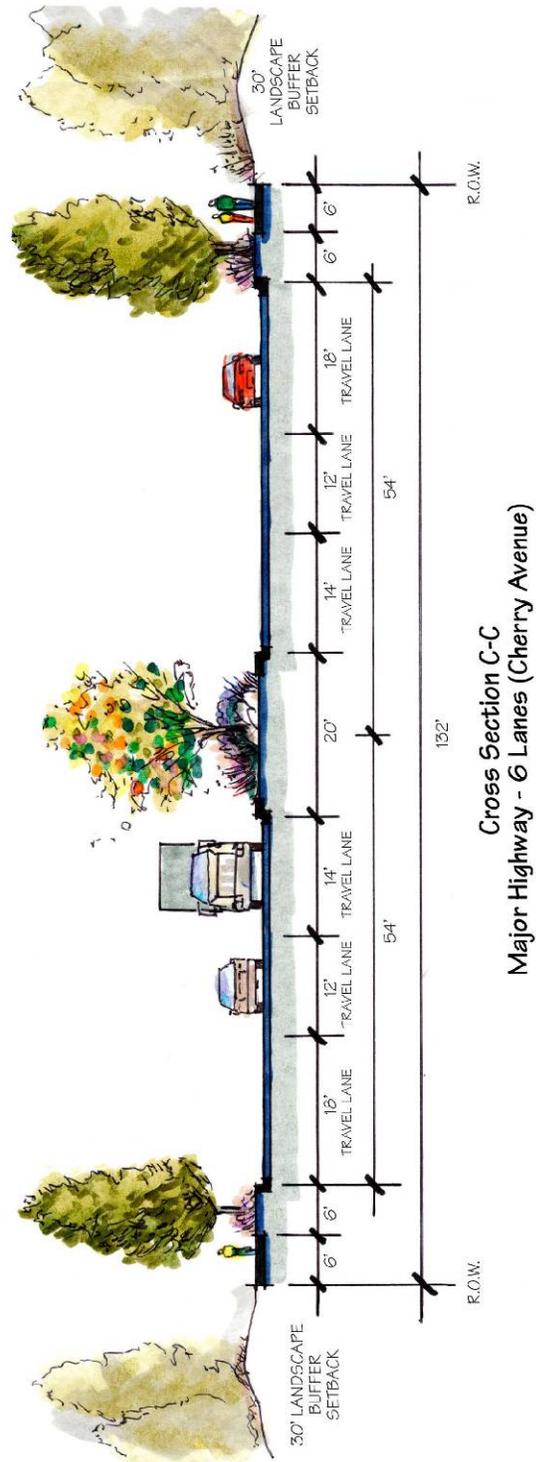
Major Highway – 6 Lanes – Cross Section C-C (Cherry Avenue)
